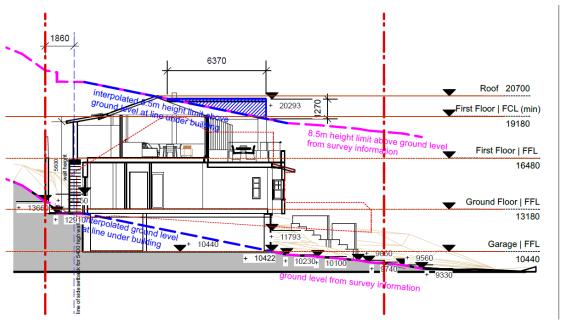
Section indicating proposed roof exceeding Council's Height of Buildings control (Source: Your Beautiful Home)
